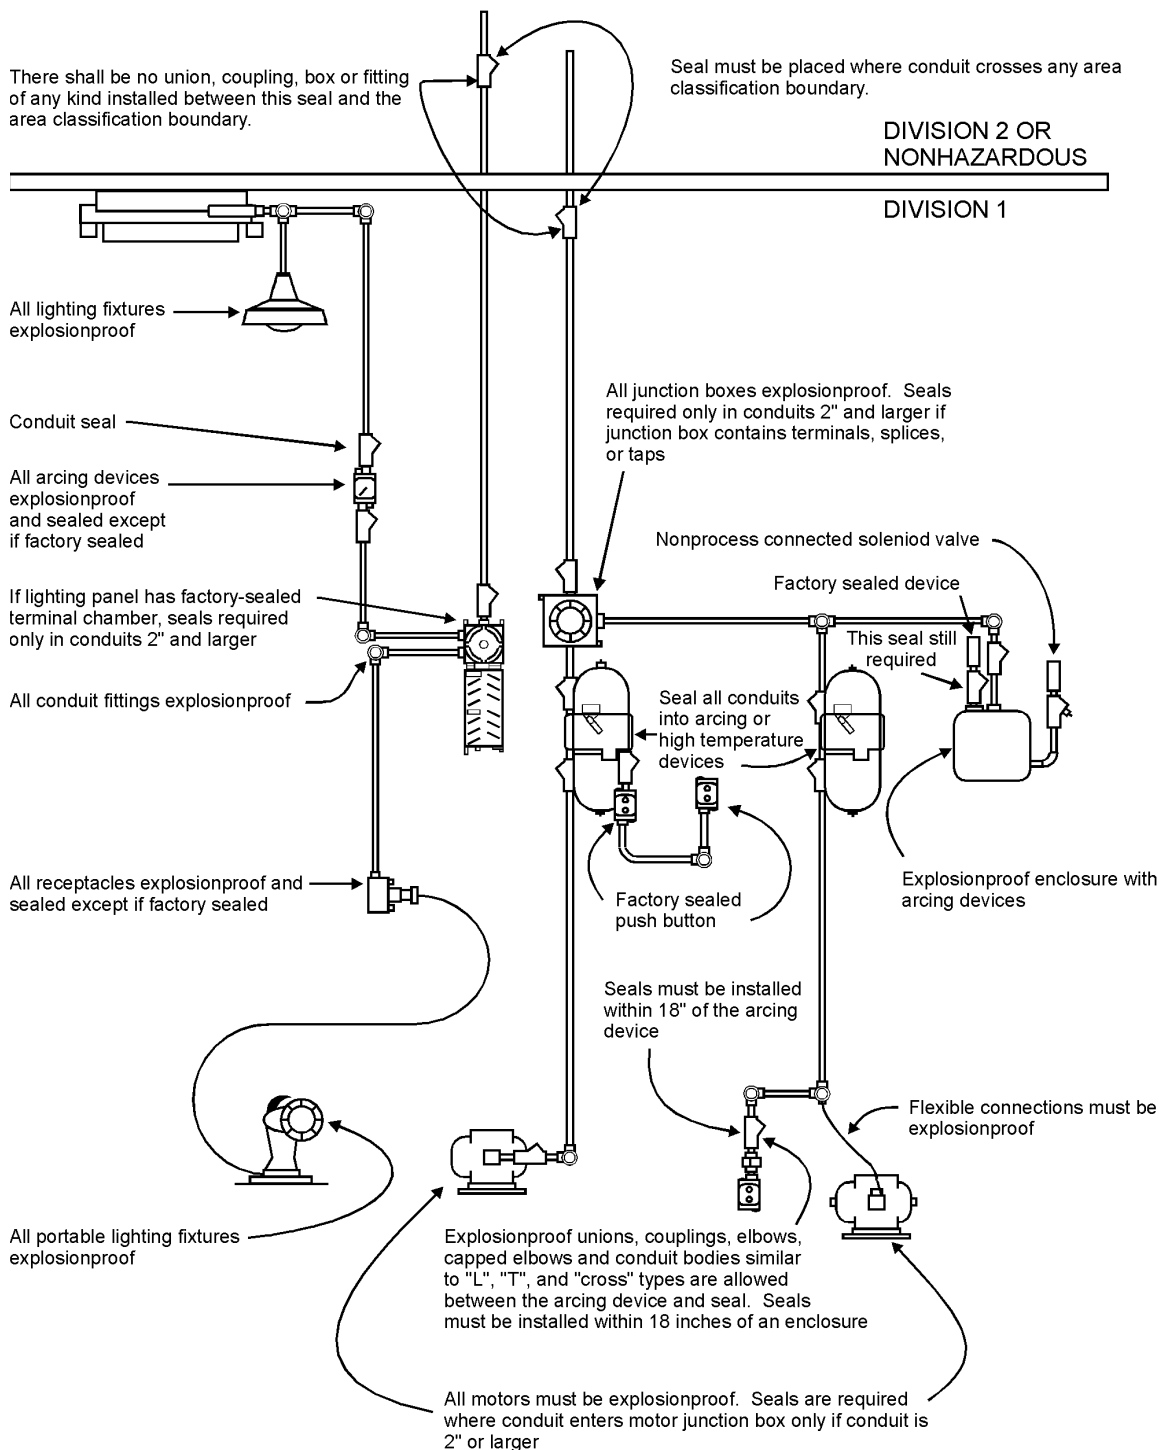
Typical United States and Canadian Class I, Division 1 conduit system installation
